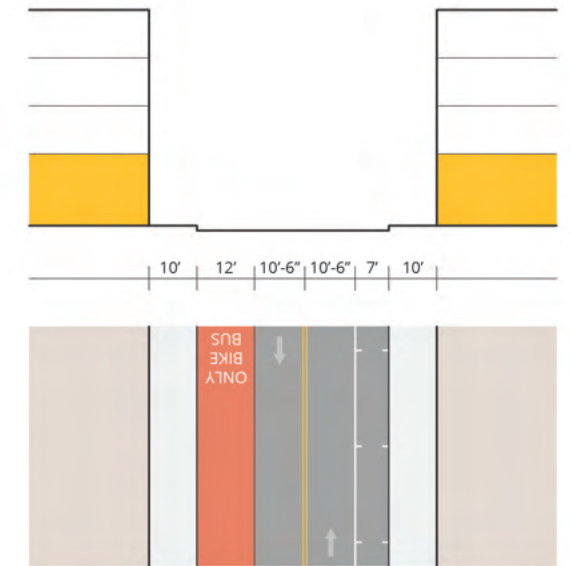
MERIDIAN STREET BETWEEN PRINCETON STREET AND SARATOGA STREET - PROPOSED CONDITION
